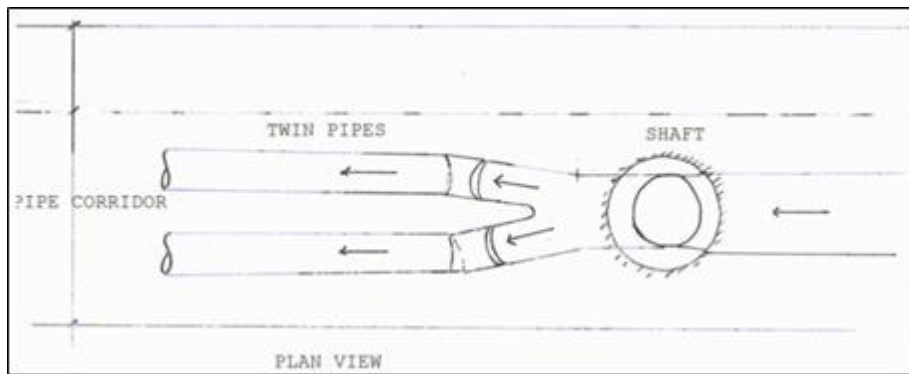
b: Indicative Plan View of Shaft and Pipe at Demra Canal
